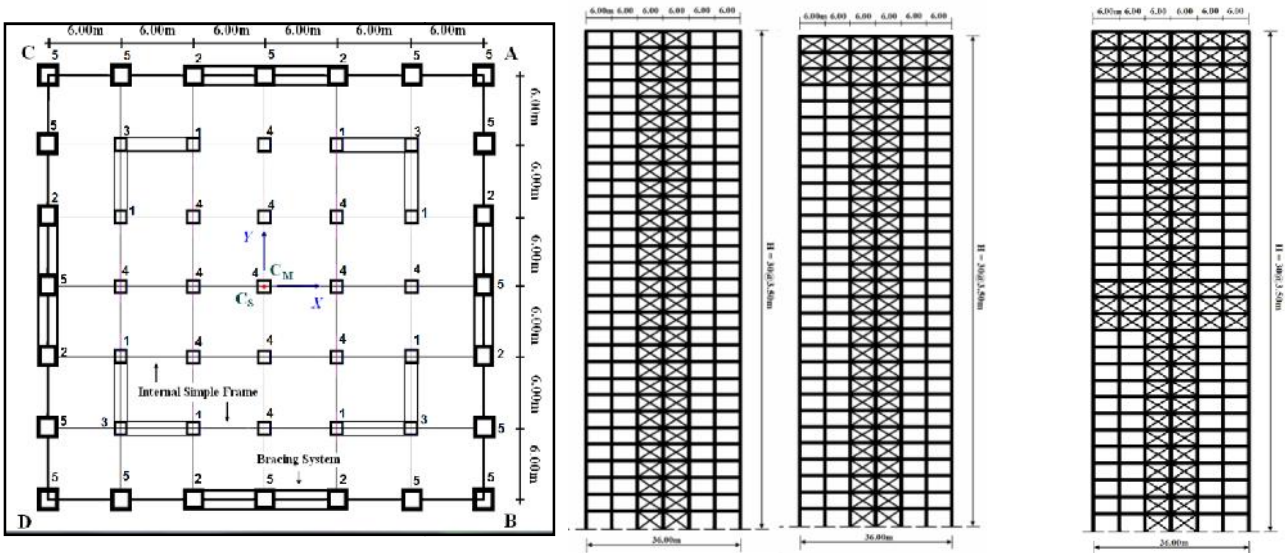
The plan and elevation of the studied structures,  $C_M$ : mass center,  $C_S$ : shear center
